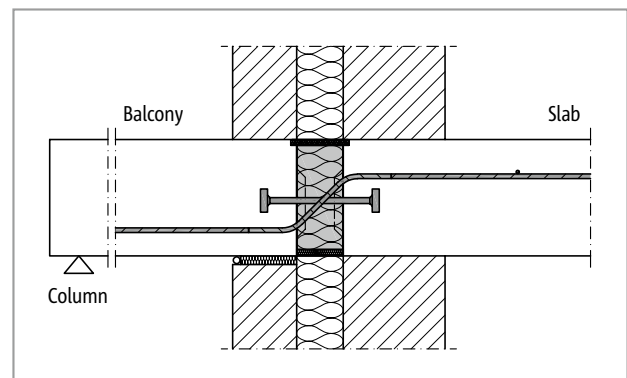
Schöck Isokorb® T type Q-P: Connection supported balcony with thermal insulating cavity masonry
